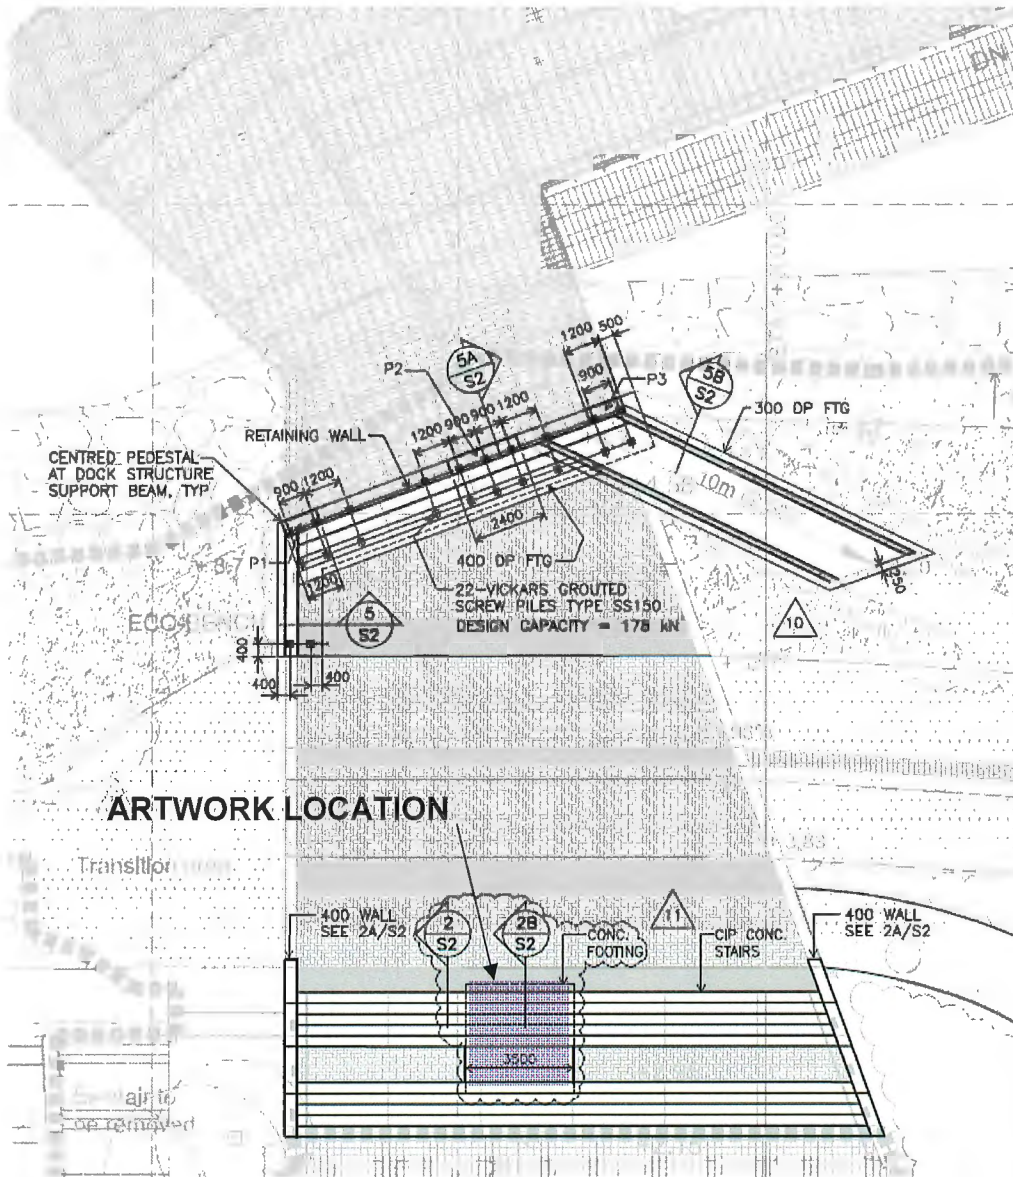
Waterfront Park partial Plan – concrete pedestal on upper stairs
